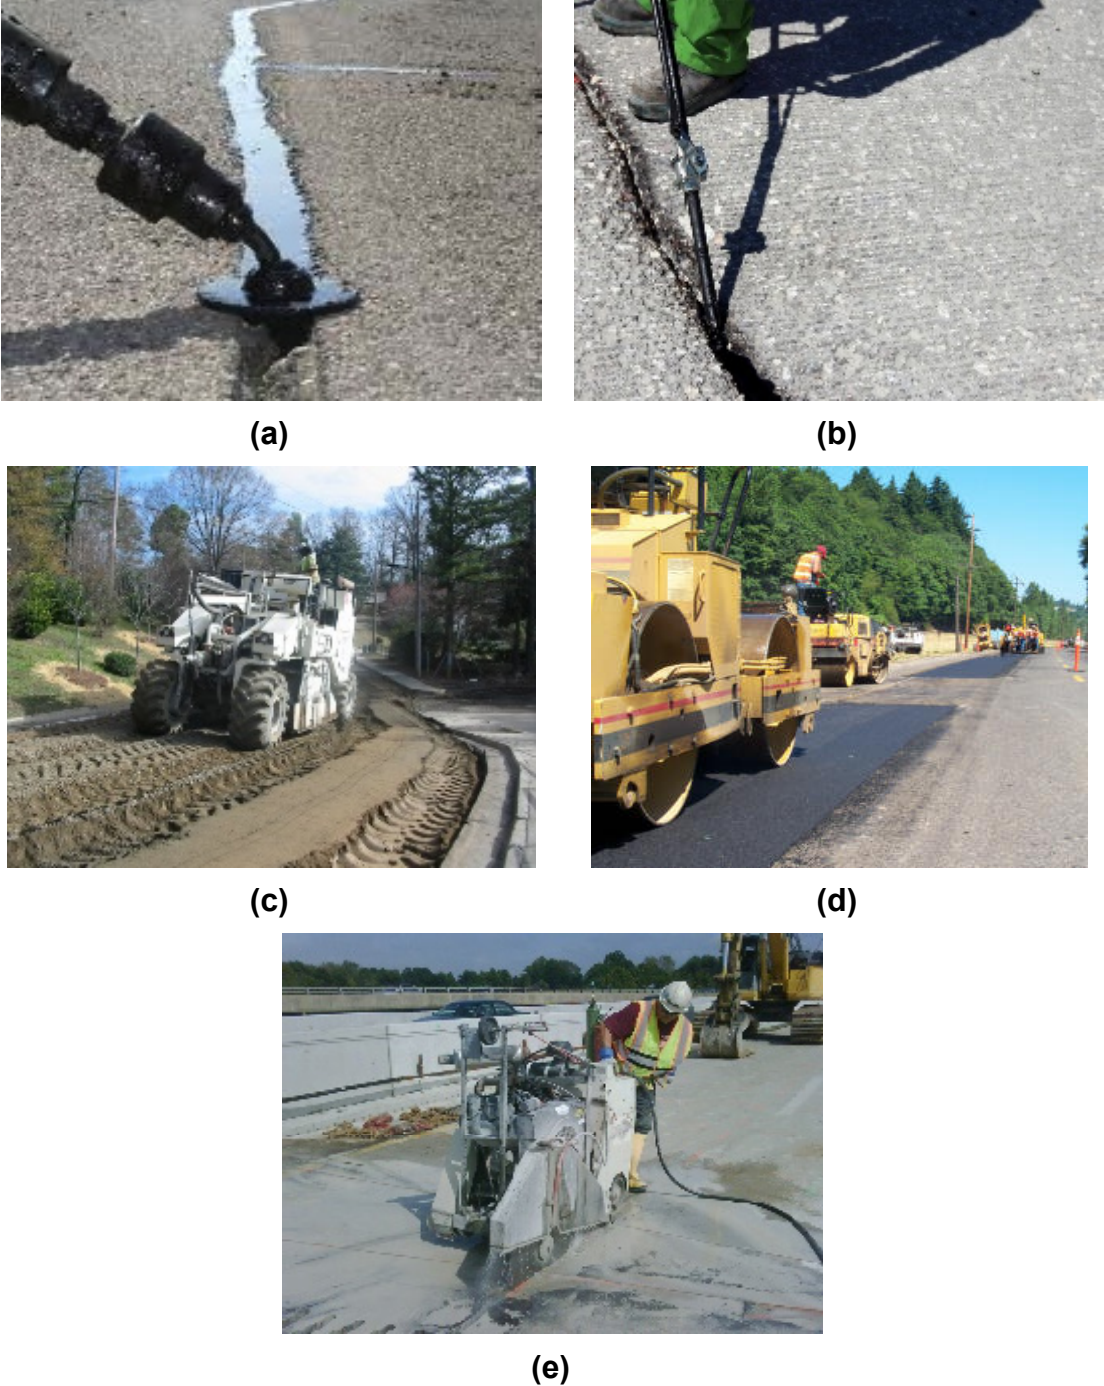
Engineering Crack fixing procedures, (a) Crack sealing. (b) Crack filling. (c) Full-depth reclamation. (d) Thick overlay. (e) Saw and sew.
